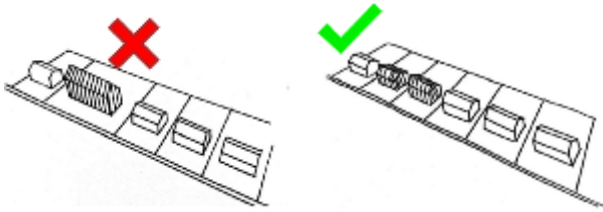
Suitable size and shape of added buildings through infill process (Author)
